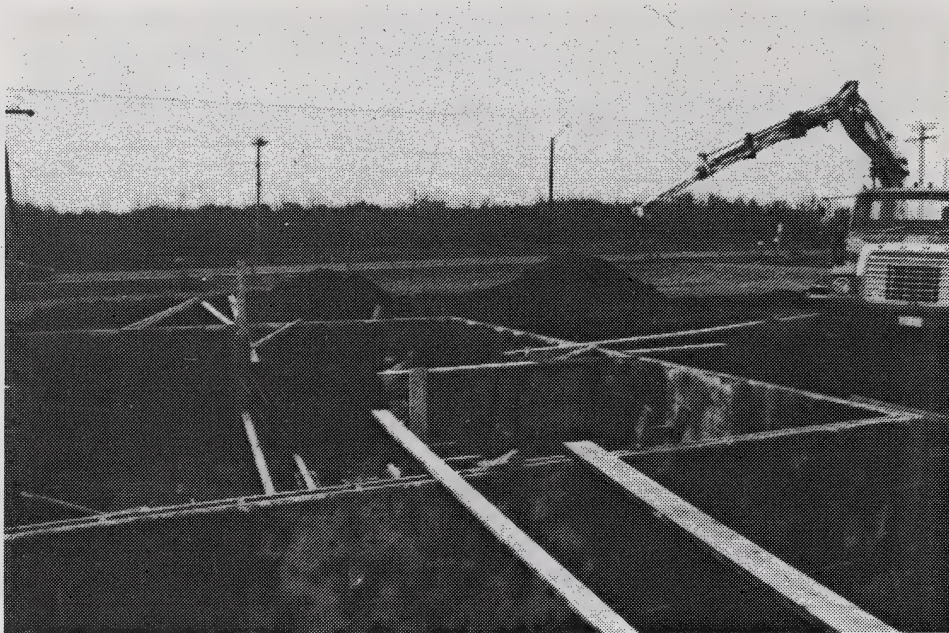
WESTWARD VIEW OF COMPLETED FOUNDATION WALL FORMWORK
